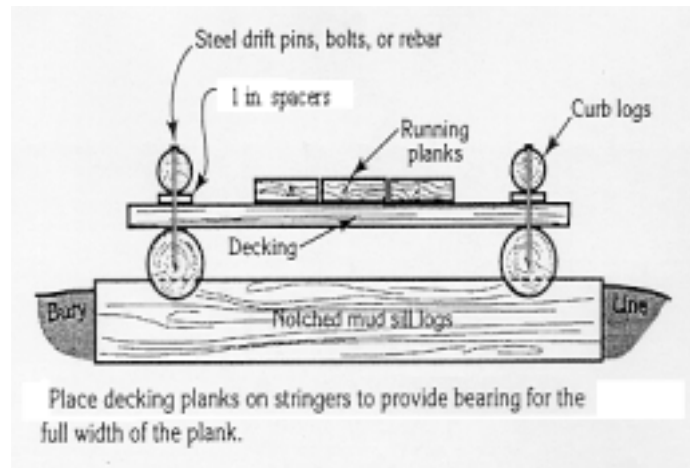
End View of Puncheon with decking, running planks, and curb logs
